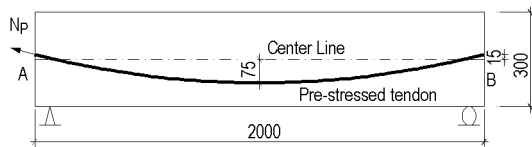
Prestressed tendon layout of rectangular section beam (mm)
